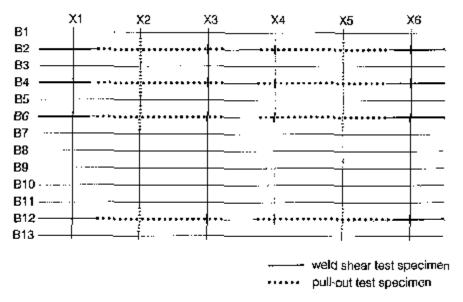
Welded wire fabric divided into weld shear and pullout specimens
